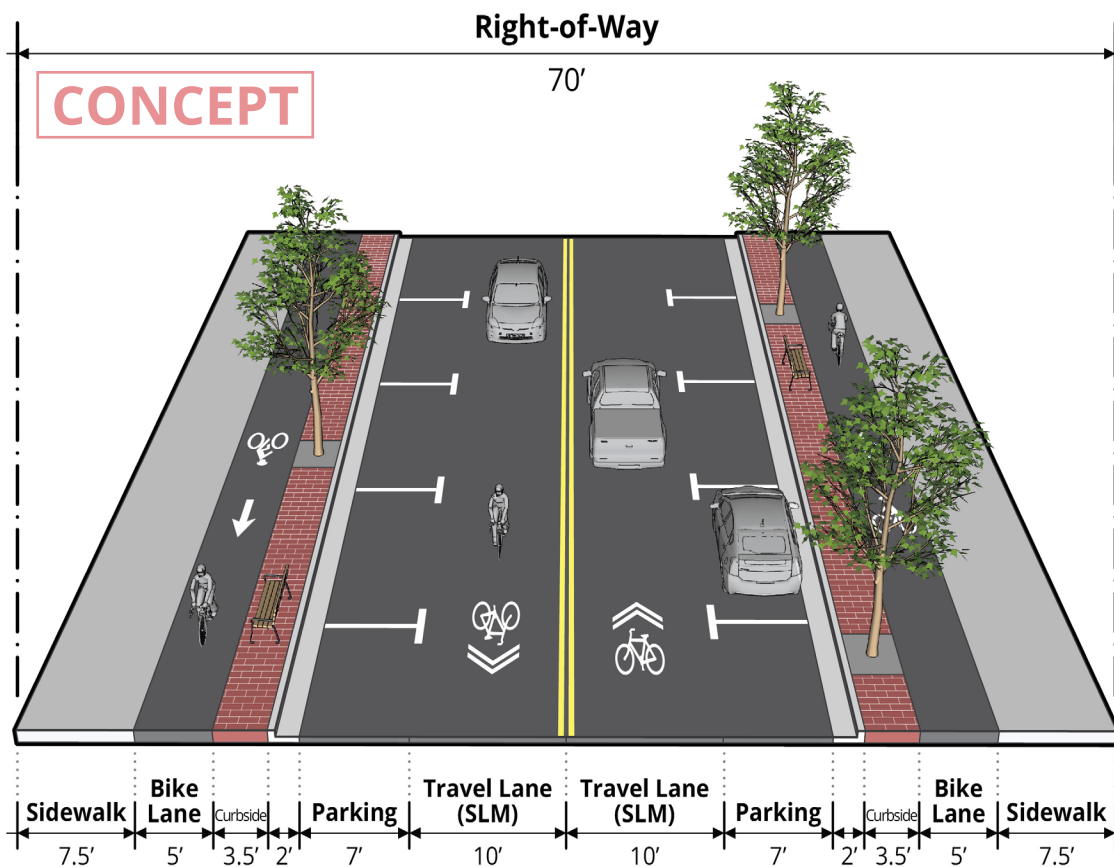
Proposed Urban Main Street Cross Section - Future Town Center Roadway.
